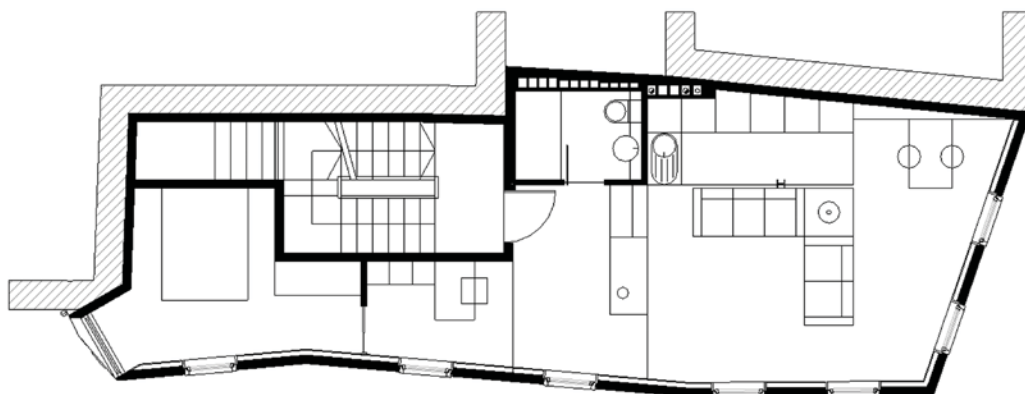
Housing in Rúa Falcón. Typical floor plan.
